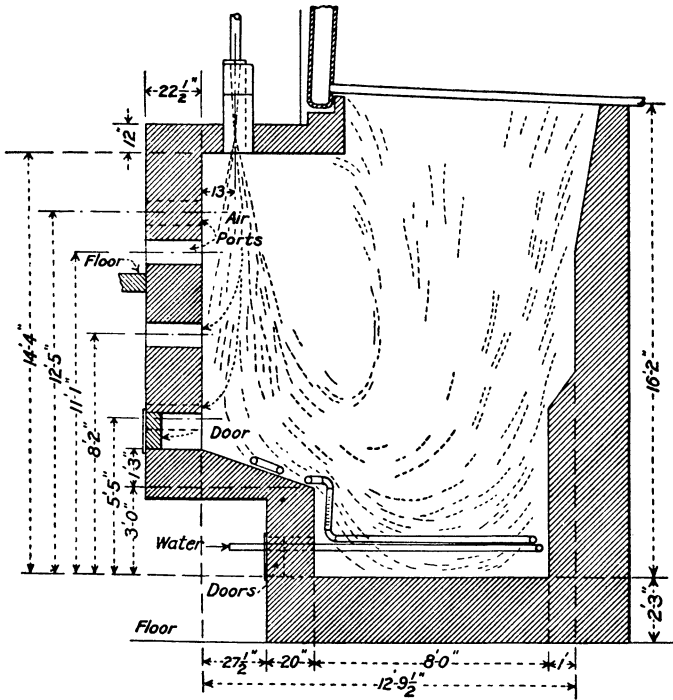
Section through furnace, showing arrangement of burner and cooling coil over hearth and near bottom of furnace.
